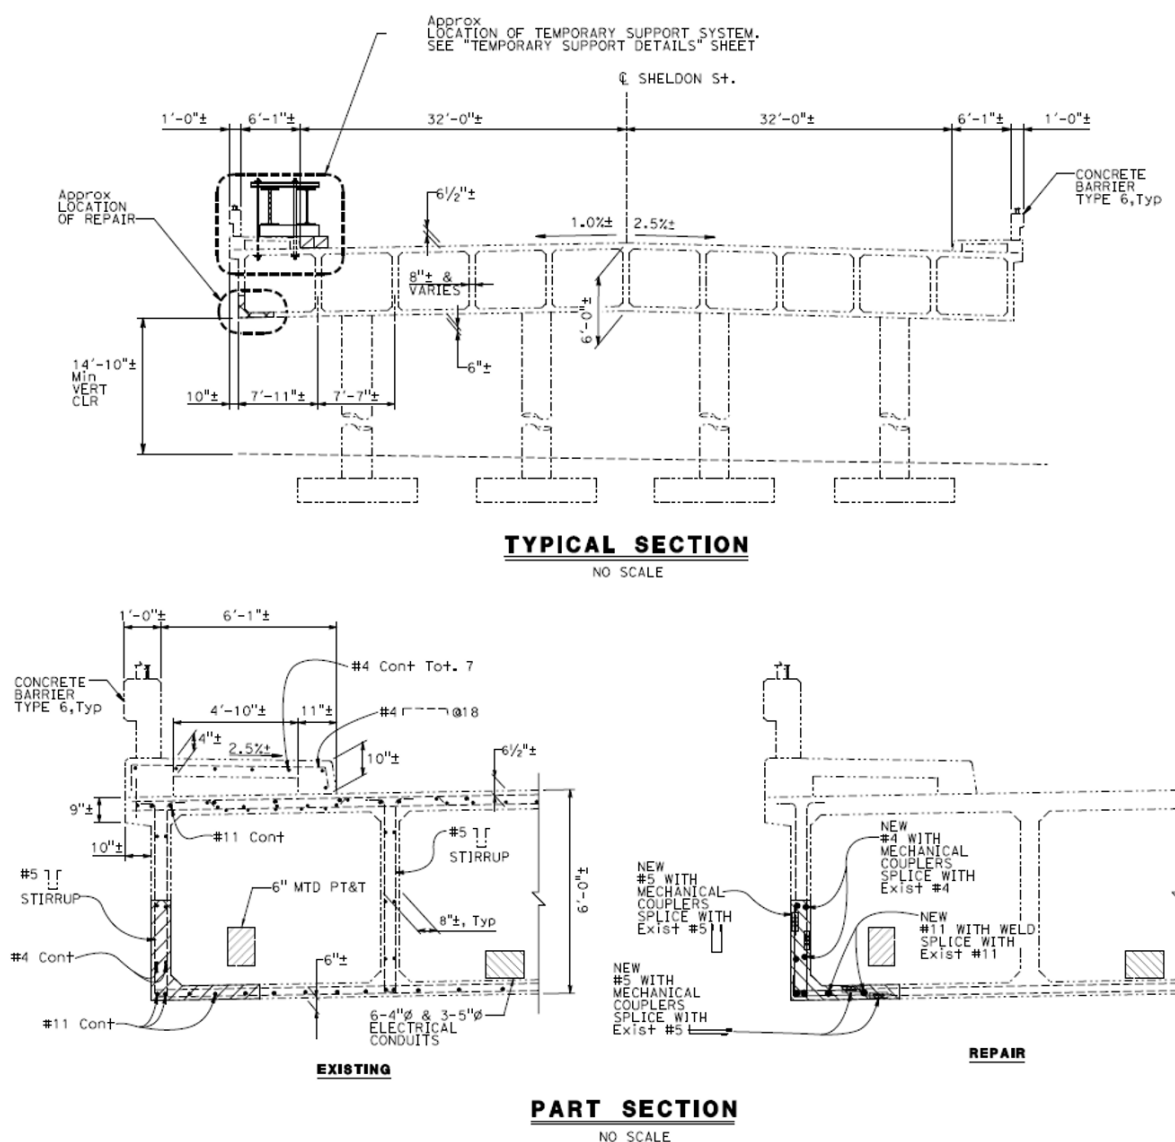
CIP Reinforced Concrete Box Girder Repairs (Bridge No. 53-1120)
